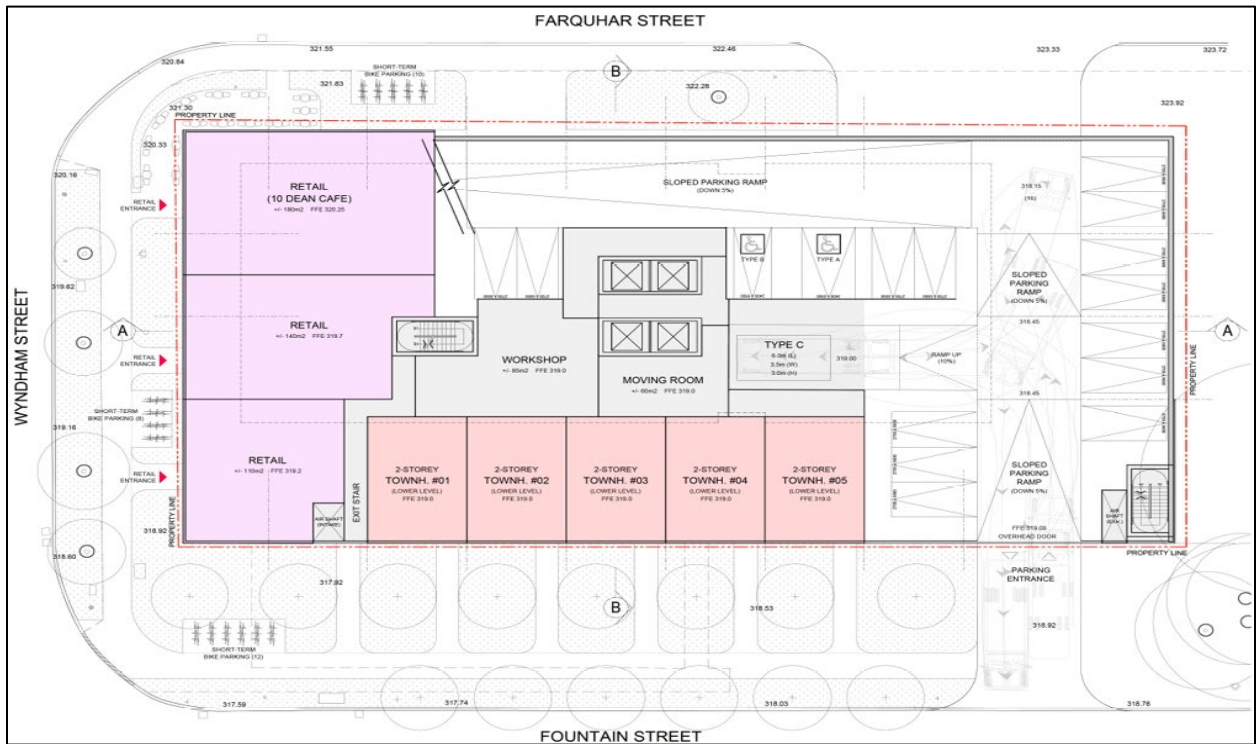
Lower Ground Floor Plan (Source: Hariri Pontarini Architects)
